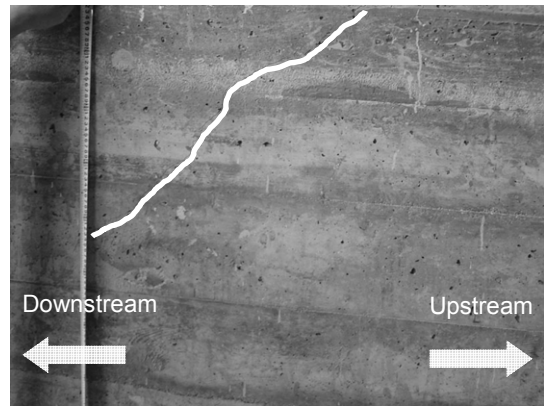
Opening of Joints on Balustrade (Hinata Dam)
